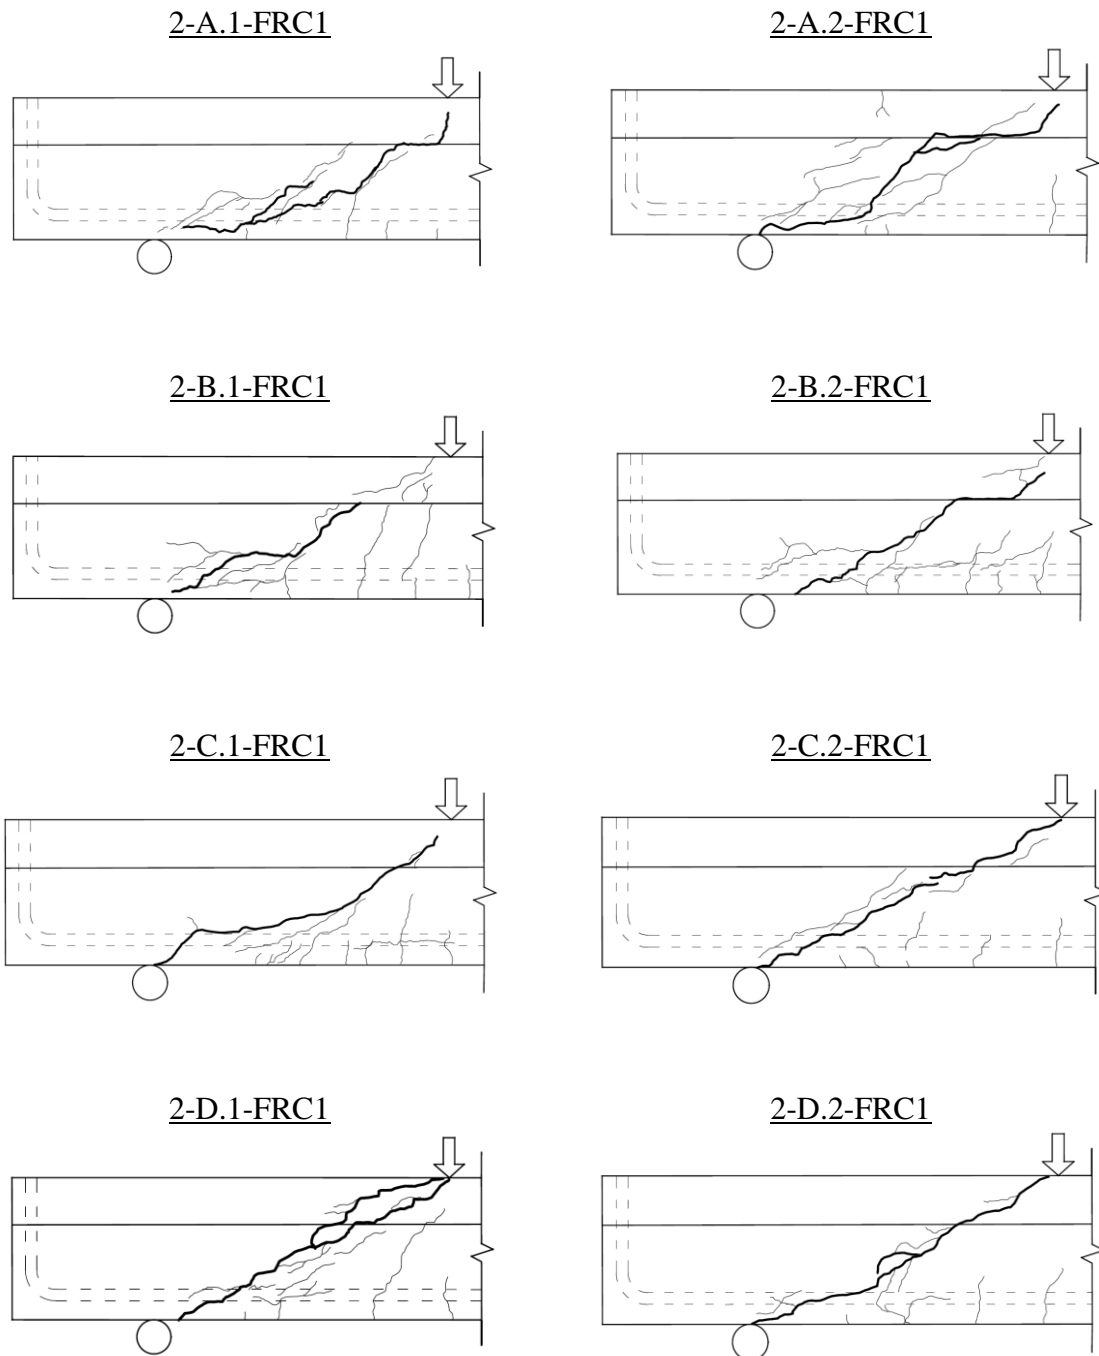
Final crack pattern of beams in Set 2 containing 1 % fibres.
